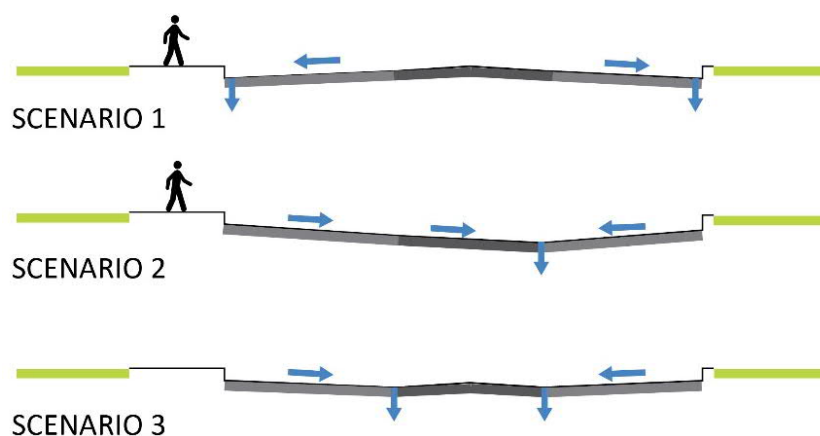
TYPICAL ROAD CROSS-SECTIONS
